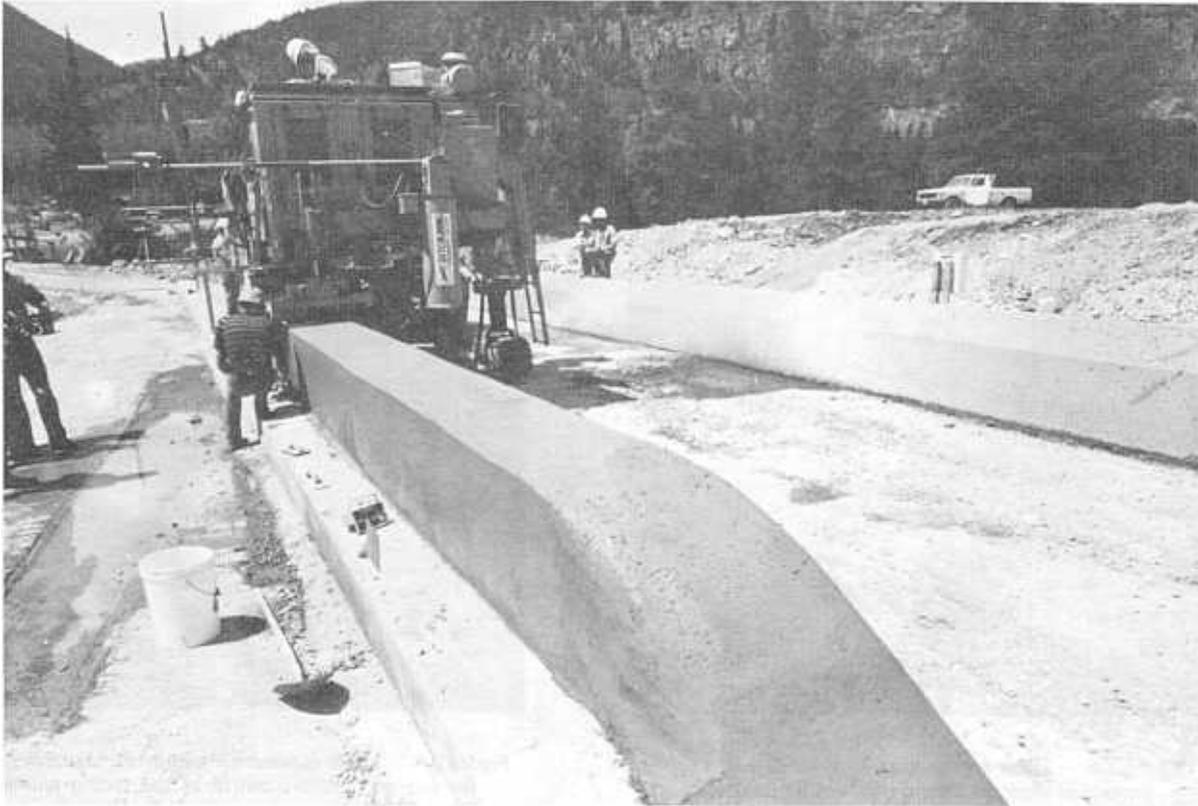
A. – Downstream facing element being placed by laser controlled slipform paving machine. P801-D-80881
